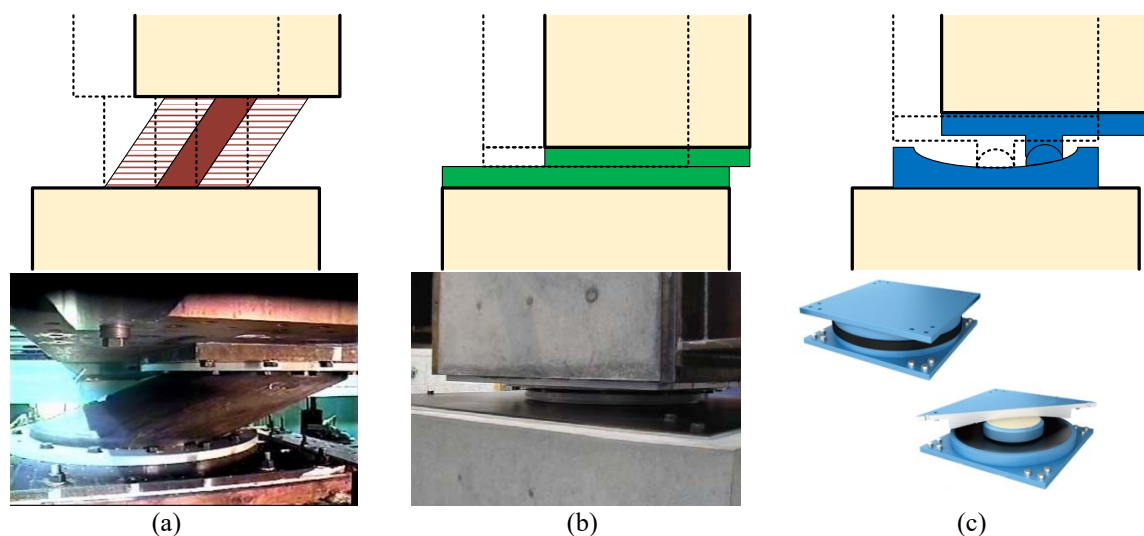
(a) Lead rubber bearing (b) Sliding bearing (c) Friction pendulum bearing.
